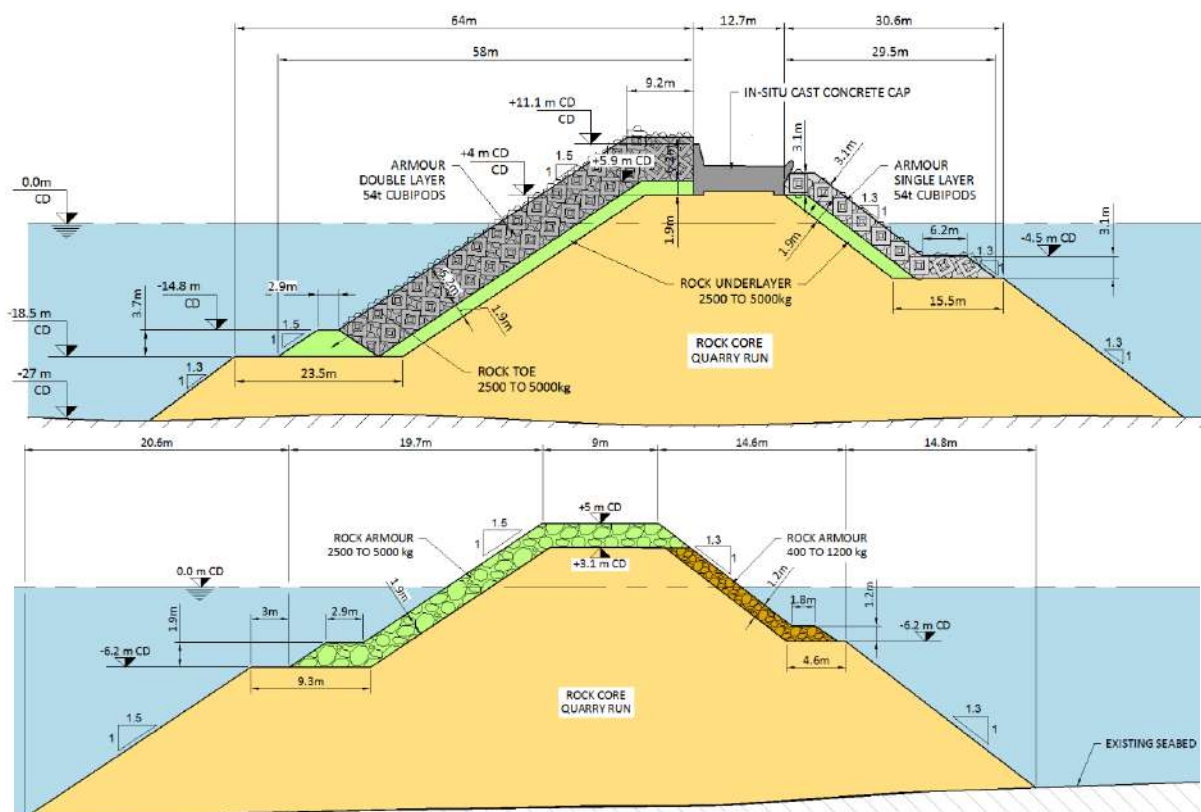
Typical cross-section of trunk of the main breakwater (top) and the secondary breakwater (bottom)
